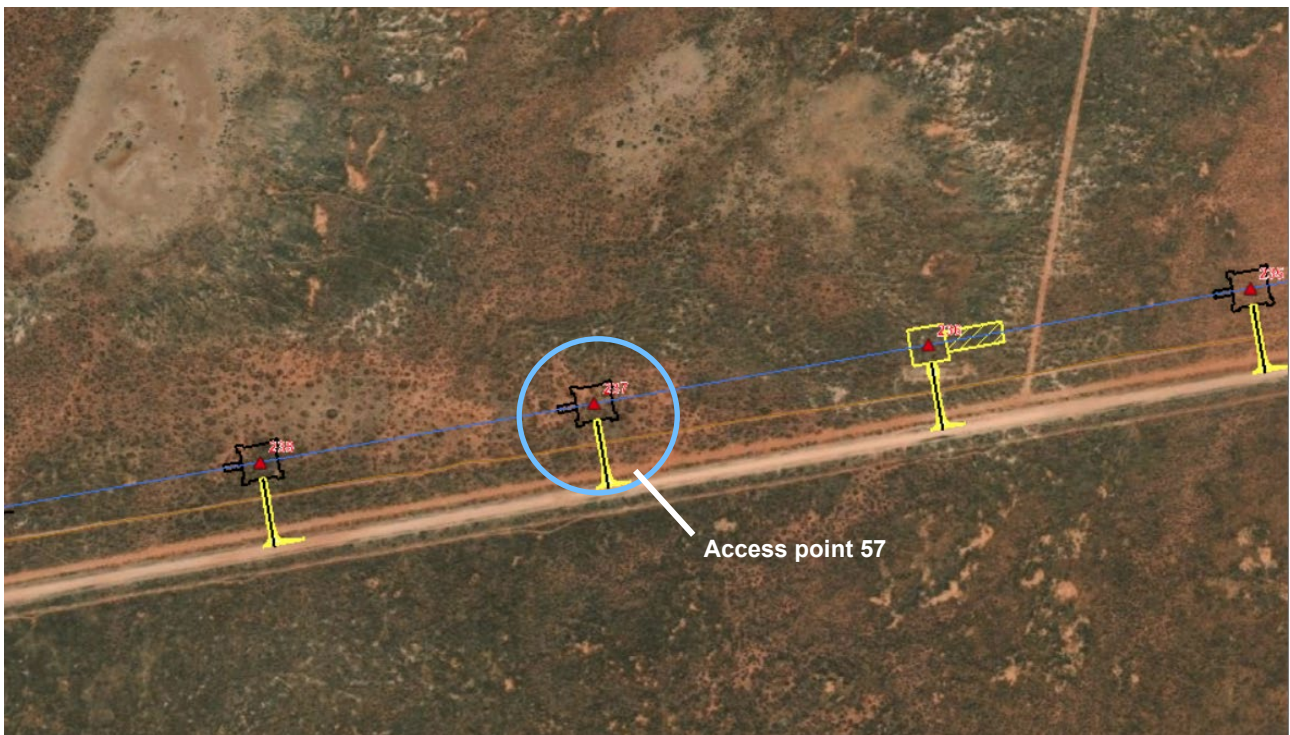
Access point 57 (Renmark Road, tower 237)
